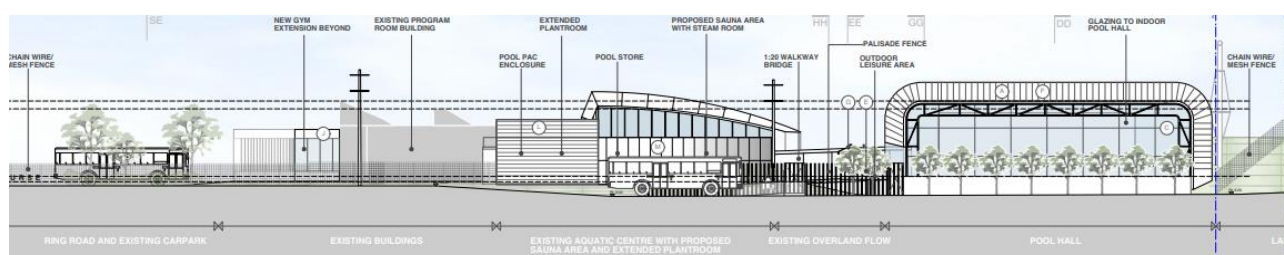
Eastern Elevation - view from eastbound traffic lane in Bareena Street.
